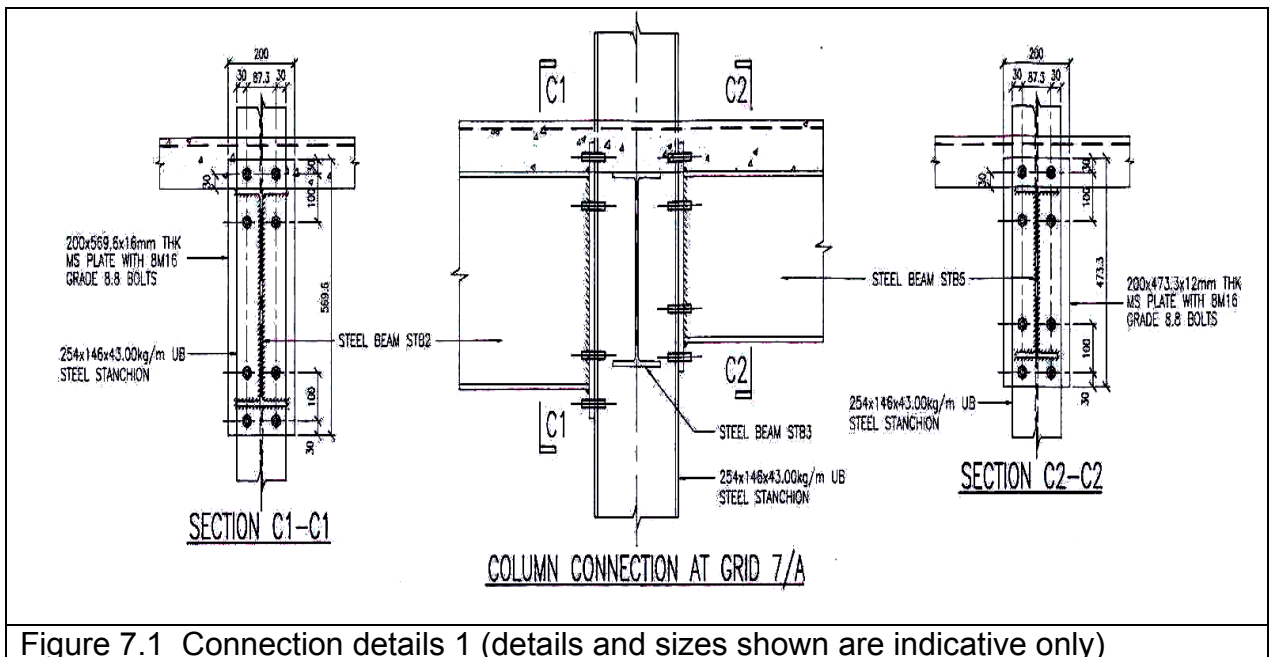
Connection details 1 (details and sizes shown are indicative only)
